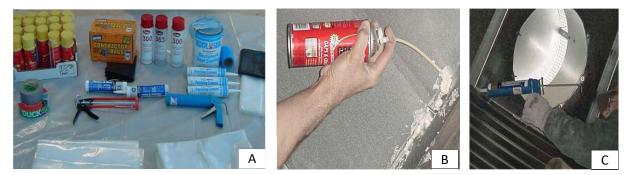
Economical sealing materials (A), foam wide roof gaps (B), silicone caulk narrow roof gaps (C).
